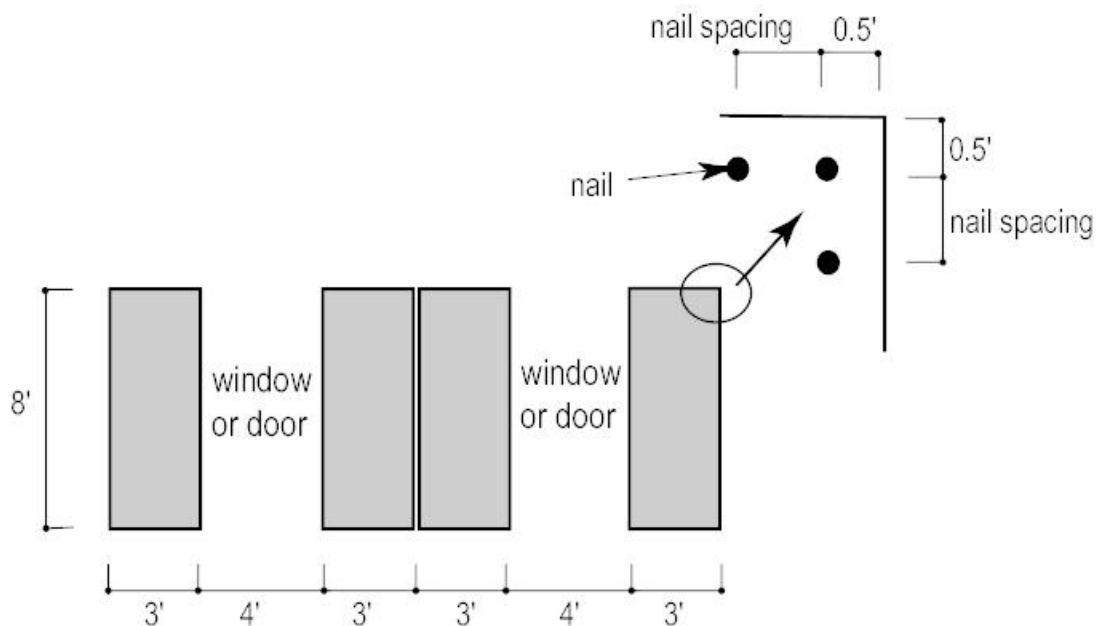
OSB Shearwall Model for Line F on the First Floor of the Large-House Index Building.
